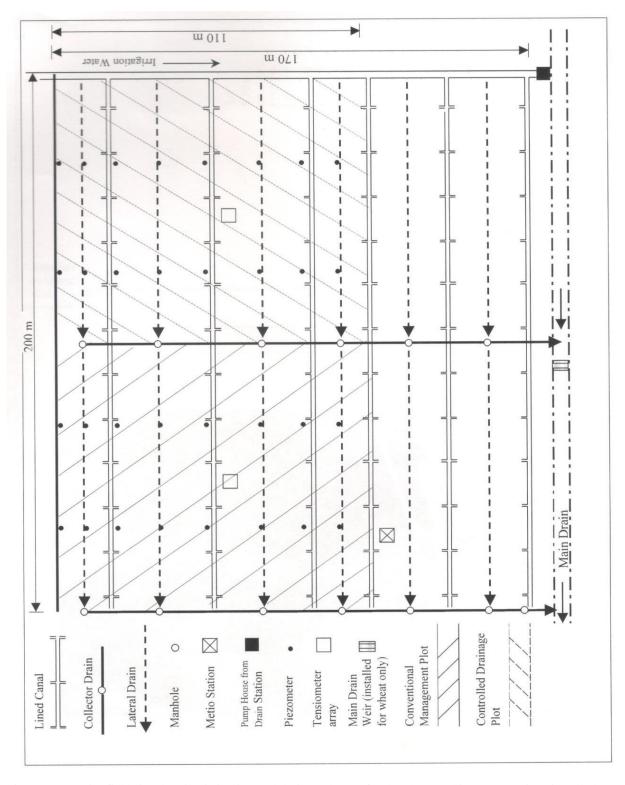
Mariut field site showing irrigation and drainage layout for the plots, and instrumentations installed.
